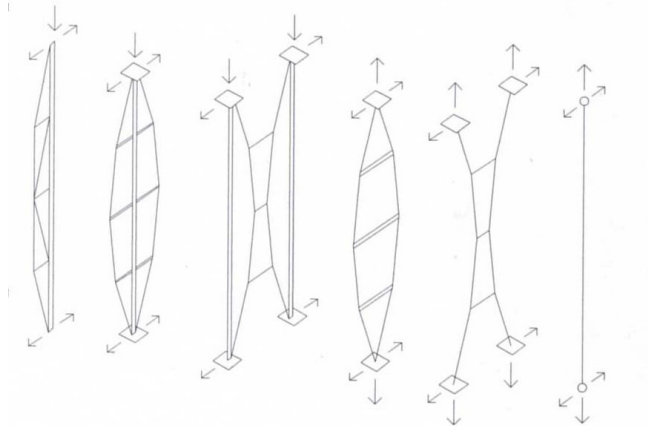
Principle primary structural systems of cable-stayed façades [1]
